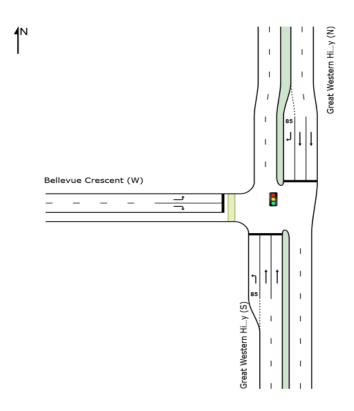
Proposed intersection alternative at Bellevue Crescent
